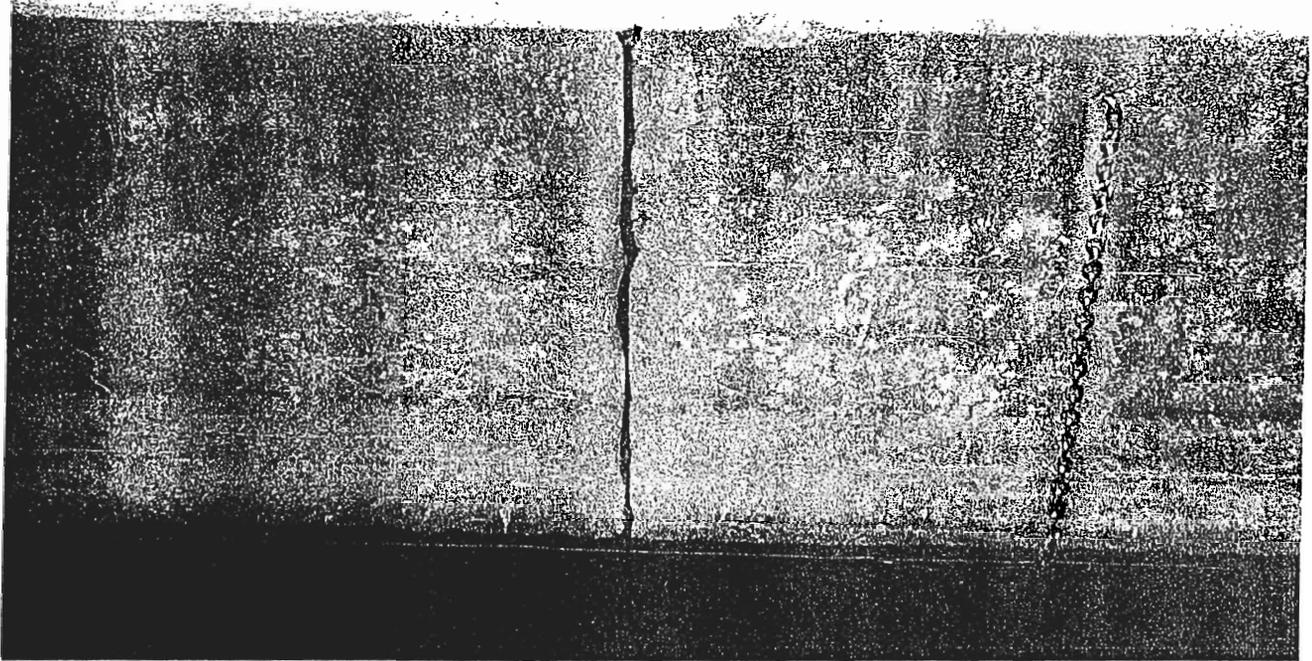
View of cold joint in concrete (in lock). Fill joint with crack filler
